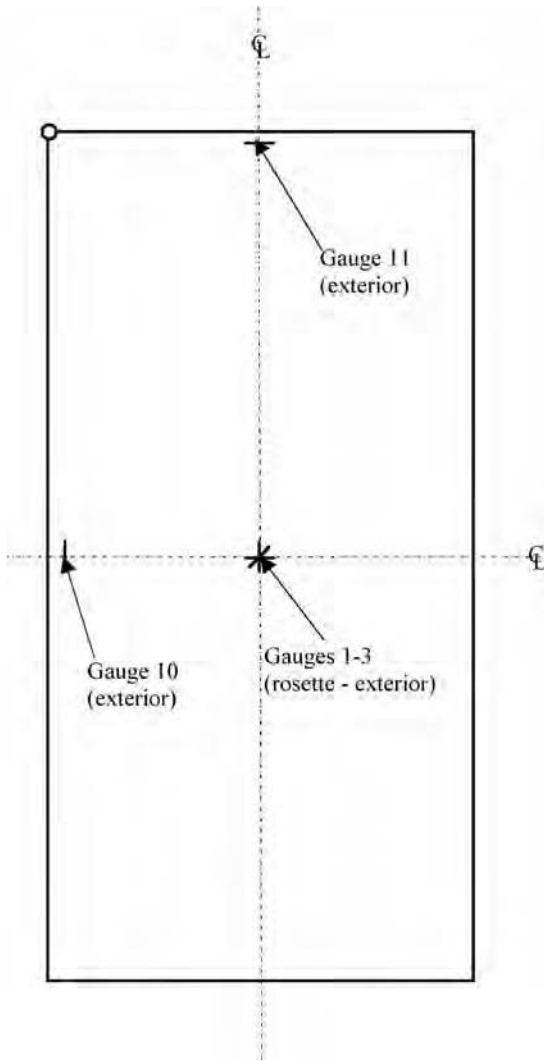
Full-scale test assembly 3 gauge location schematic.
